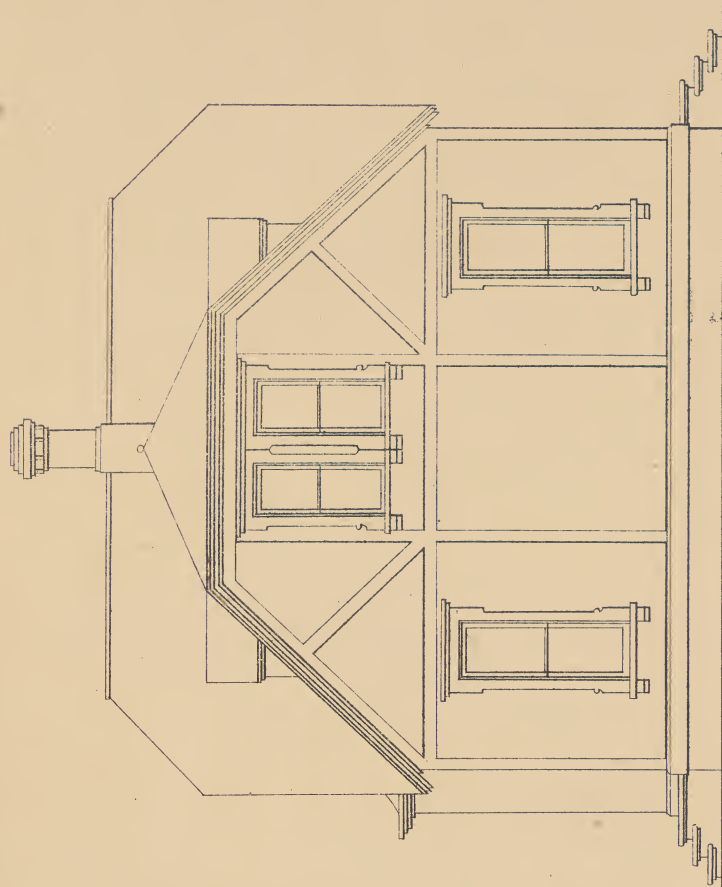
shows the plans and elevations of a cottage one and a half stories high. It is designed to be constructed of wood, and to have its roof covered with shingles or slate. All its exterior details are simple and of easy construction, the cornices being simply moulded, and having no brackets.
